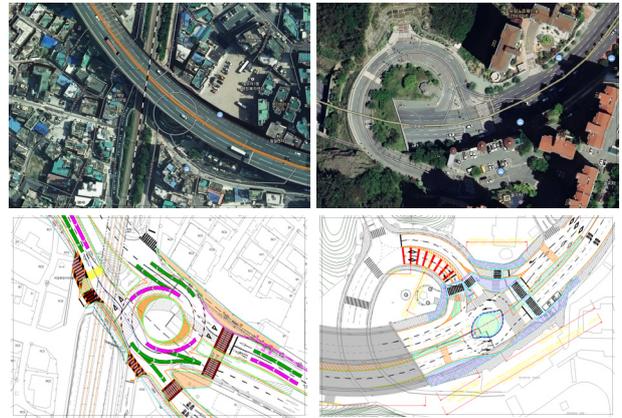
An Example (3-Leg & 4-Leg Intersection Site View)
